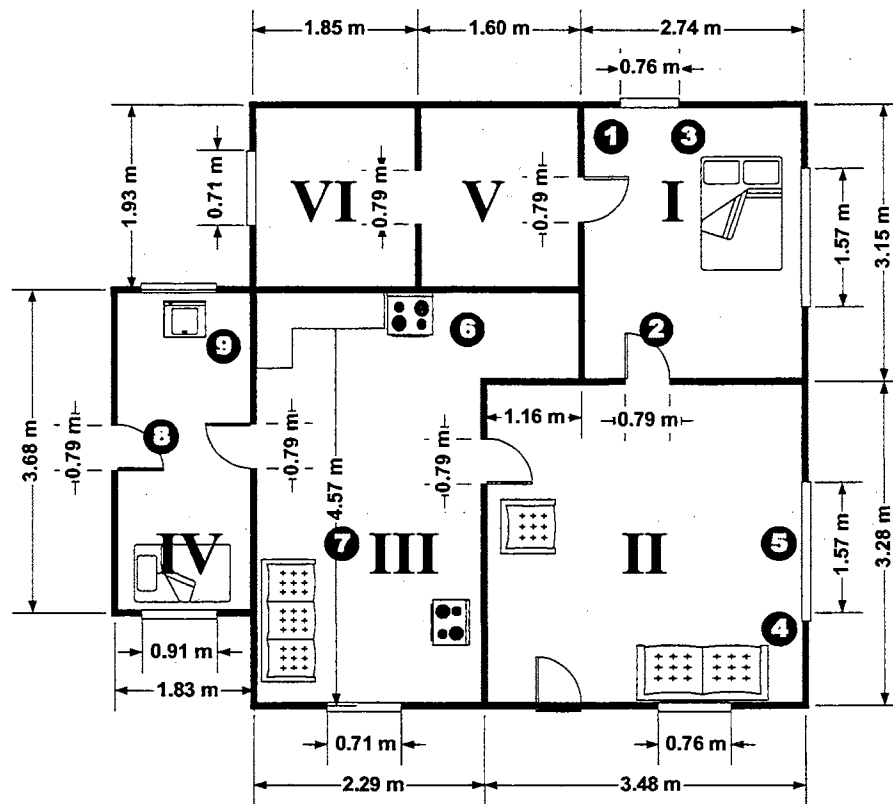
20 Floor Plan of the Structure Indicating Room Numbers and Thermocouple Locations (Small House at Tulsa, OK)
